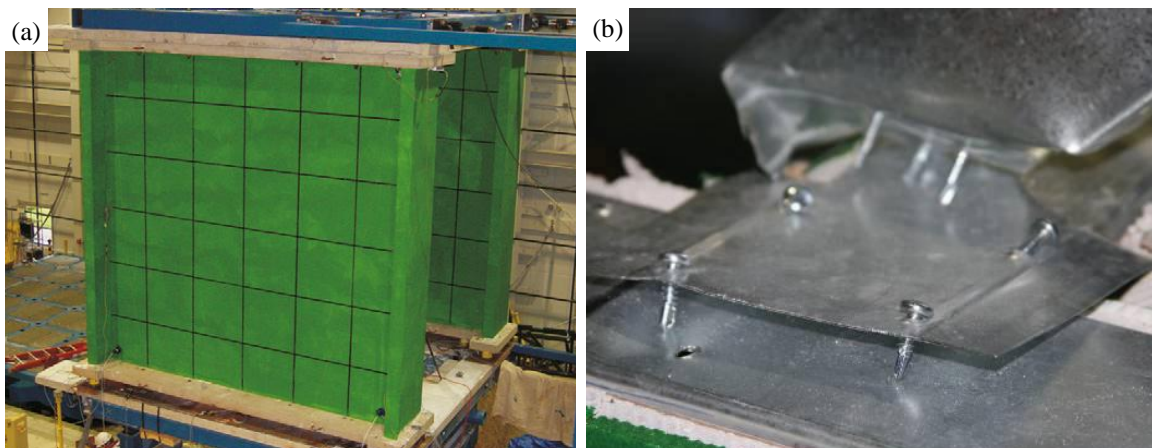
UB Partition Experiment: (a) specimen, (b) top track damage, Source: (Davies et al., 2011) and (Retamales et al., 2013)
